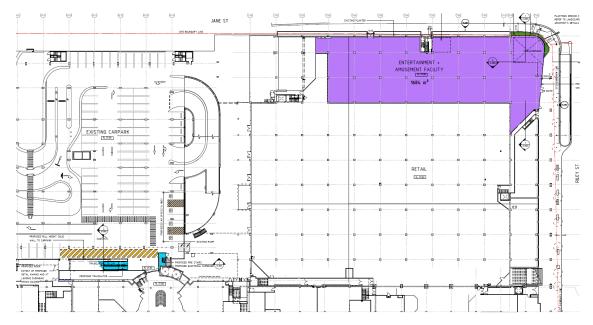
Part Retail Level 1 floor plan - Location of proposed works
